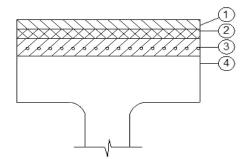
Construction of the roadway using self-stressed concrete: 1-top layer of asphalt concrete pavement; 2-lower layer of asphalt concrete pavement; 3-ten cm reinforced layer of self-stressed concrete; 4-plate main beam
